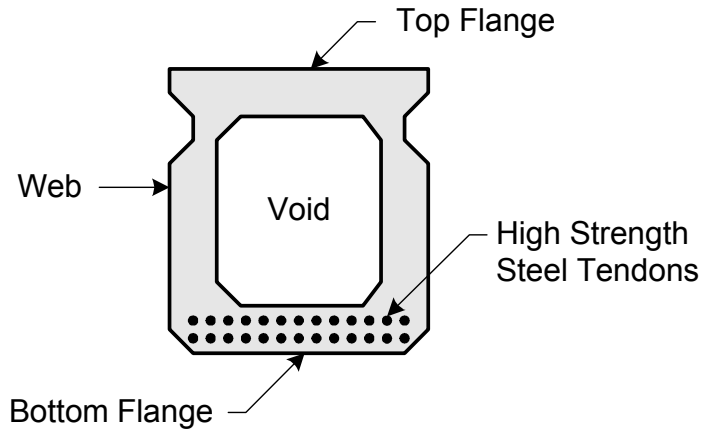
Schematic of a Typical Box Beam Cross-Section
